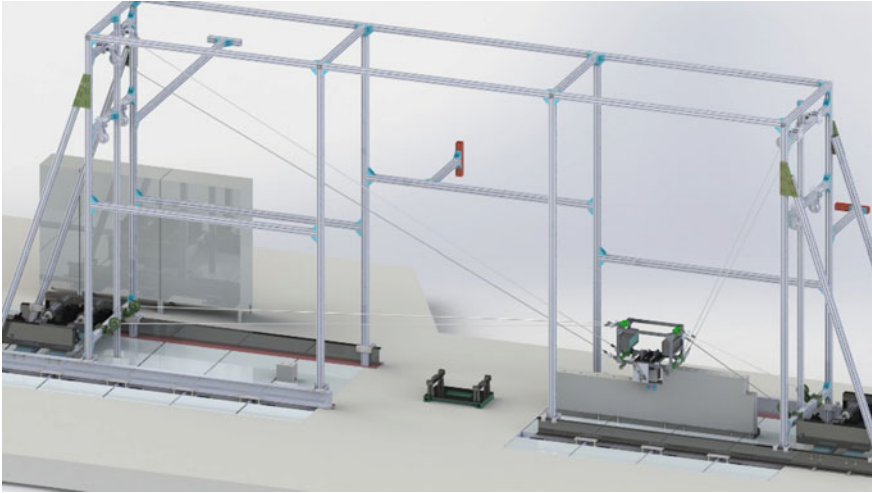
Laboratory prototype for bricking a single wall. Source [12]
